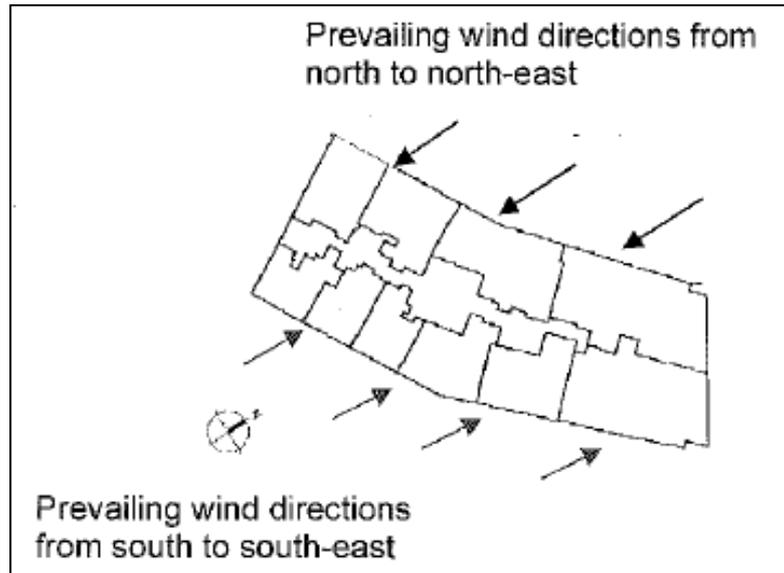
Building layout design that facilitate cross ventilation
